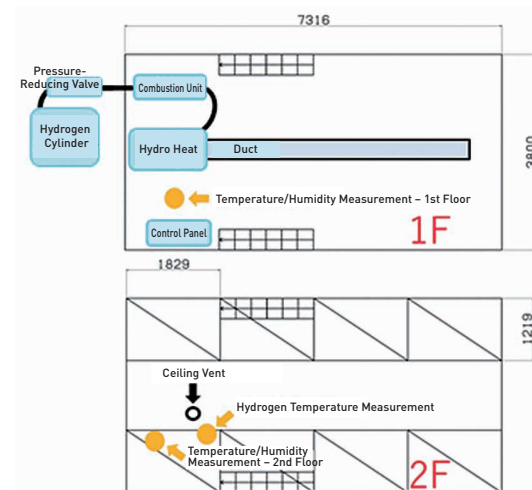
Installation of Hydro Heat Equipment and Measurement Points
